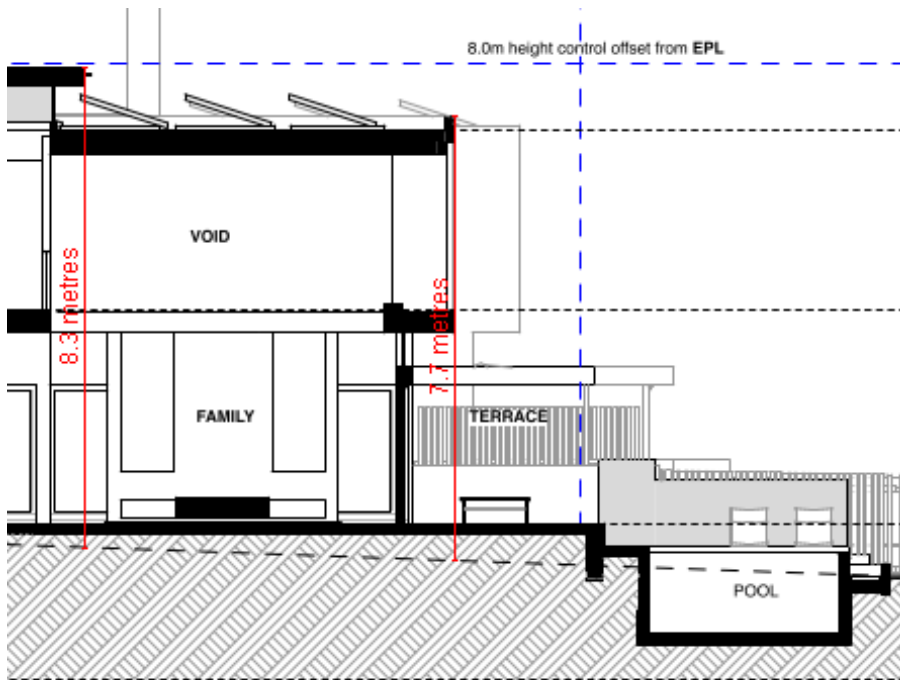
Terrace roof overhang beyond foreshore building line as shown on dwg. Section B- No 120a.
